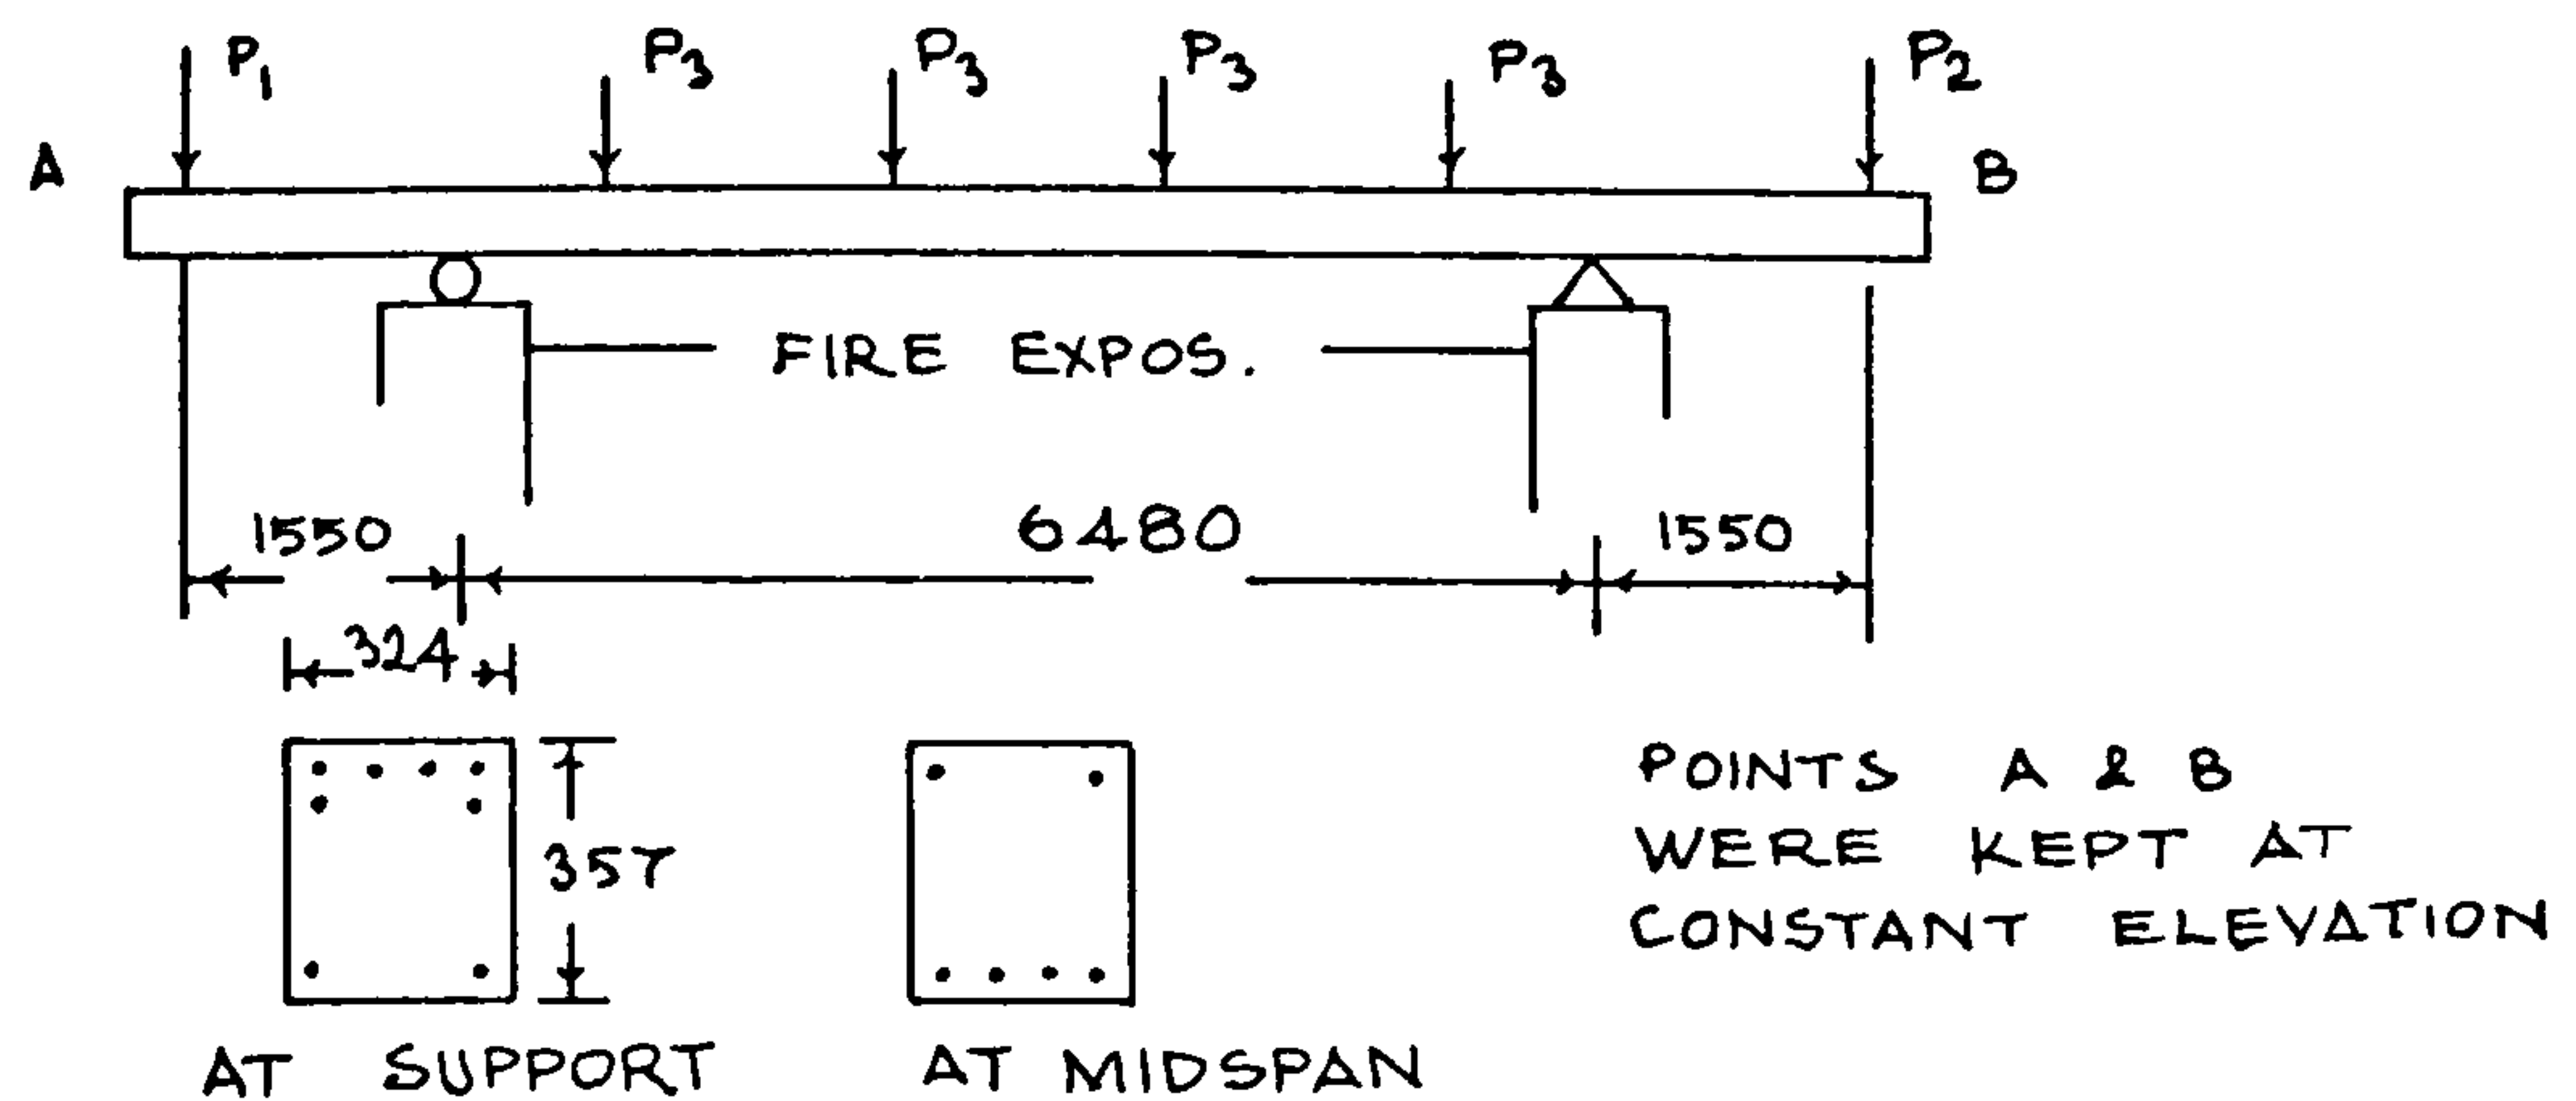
REINFORCED CONCRETE FIRE TEST SPECIMEN
